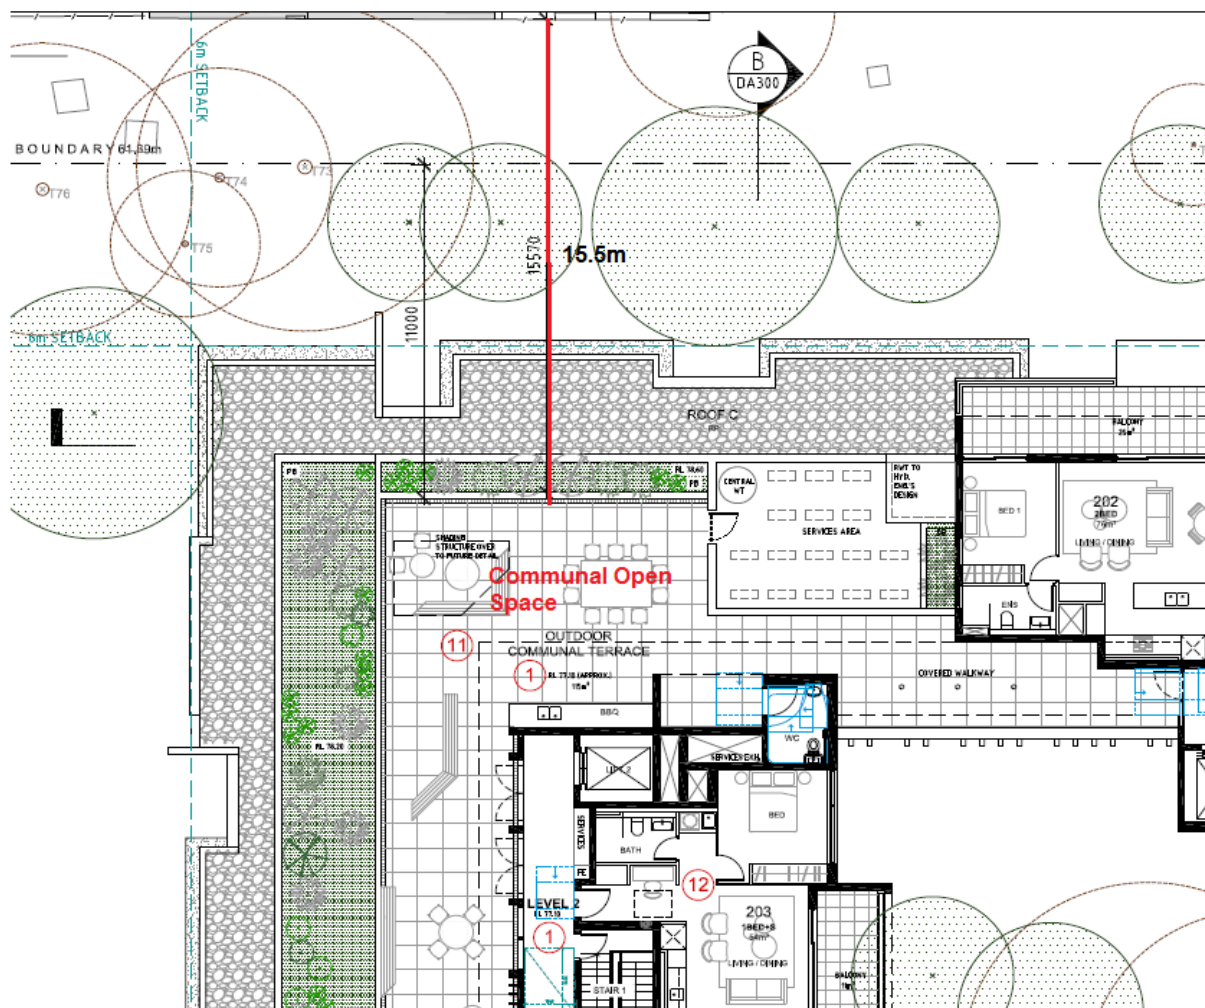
Location of the roof top terrace and separation distant between the terrace and the adjoining residential property.
